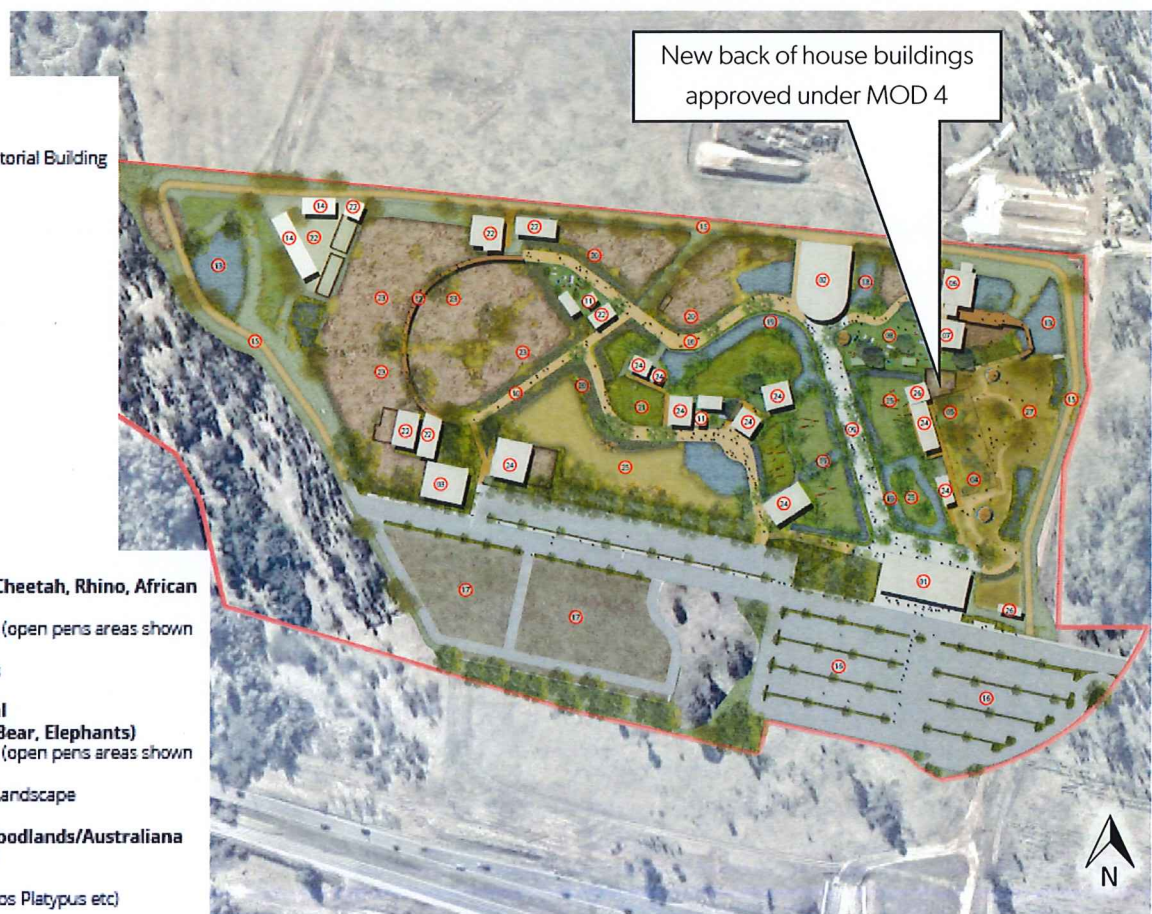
| Approved Site Layout under SSD 7228 MOD 4
